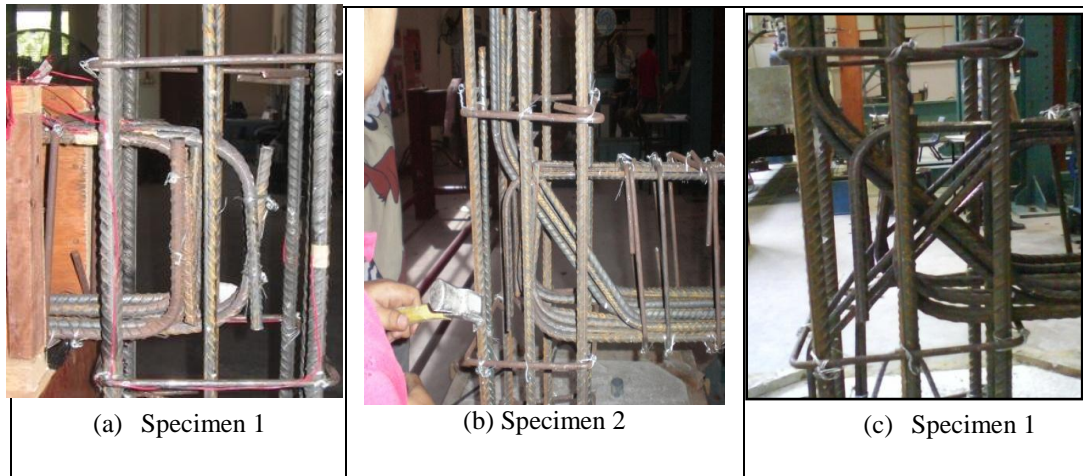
Connection detailing in beam-column connection; (a) Connection of Specimen 1; (b) Connection of Specimen 2; and (c) Connection of Specimen 3.
